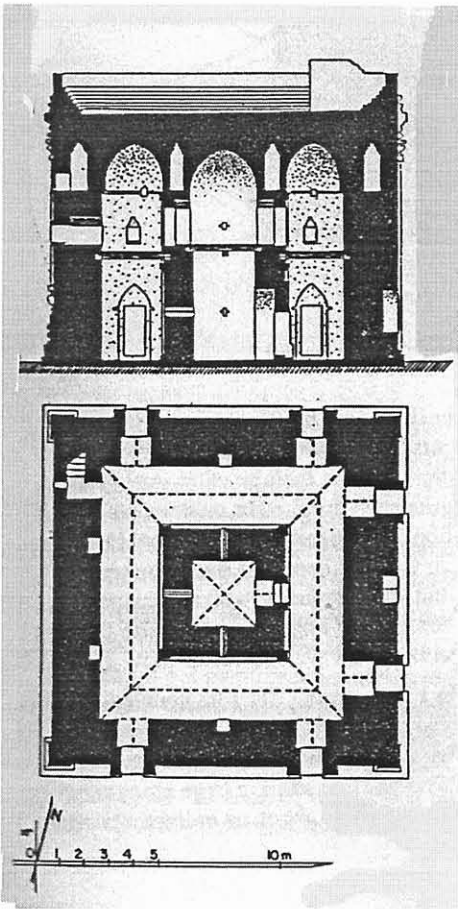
Plan and section of Shin-bo-me monastery in Bagan (13th century)
